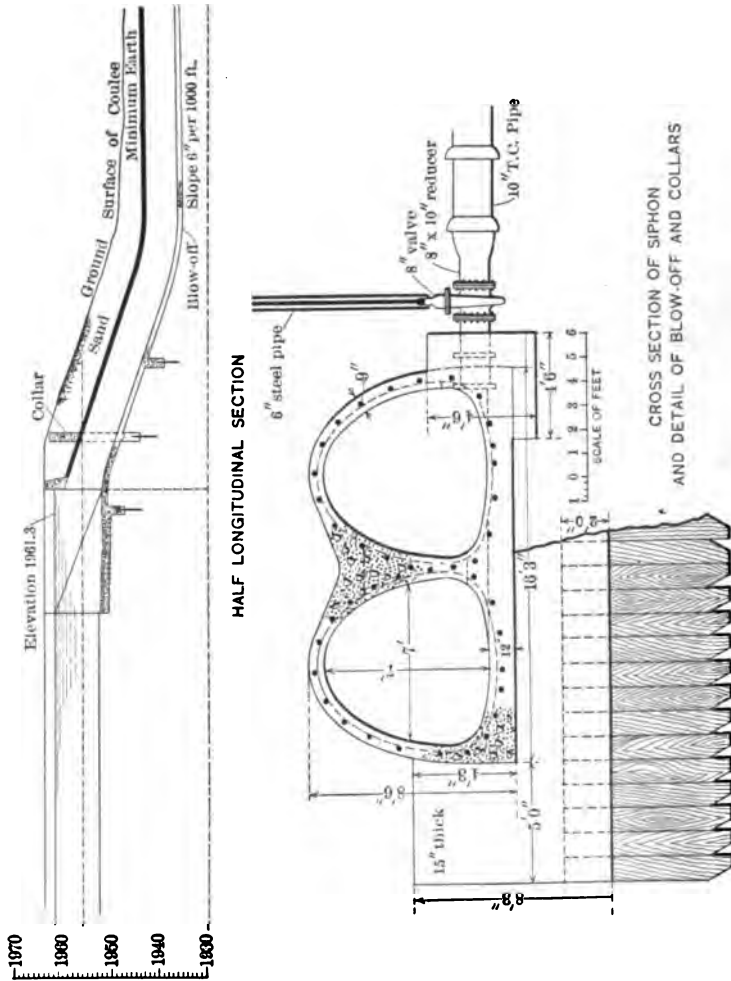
Reinforced Concrete Twin Siphon, Fox Creek Crossing, Lower Yellowstone Canal, Montana.
